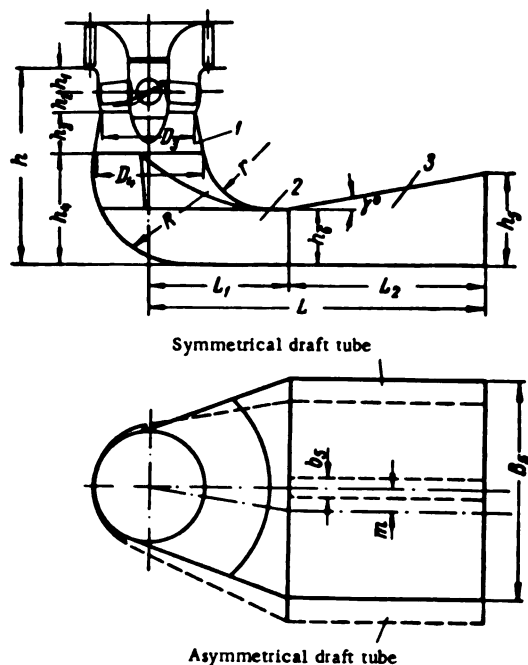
Kaplan- turbine elbow draft tube
